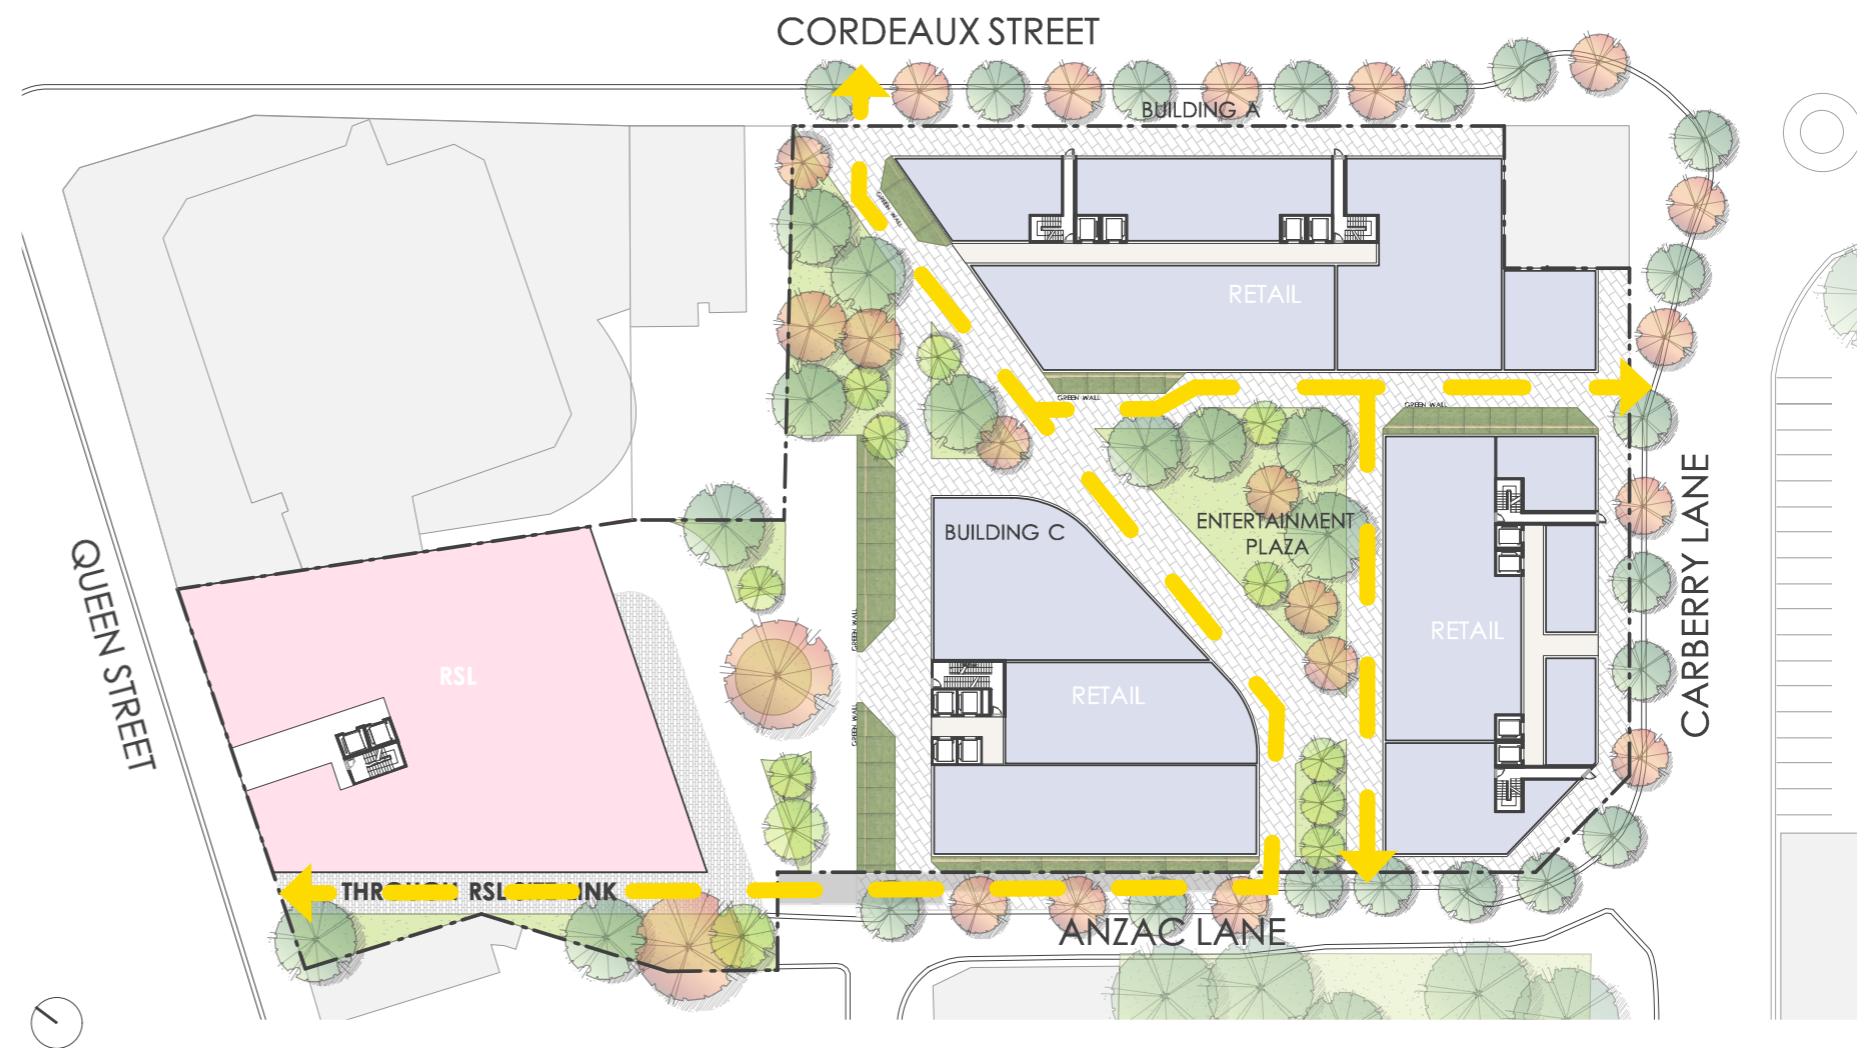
Ground Floor Plan (Source: Aleksandar Design Group)
